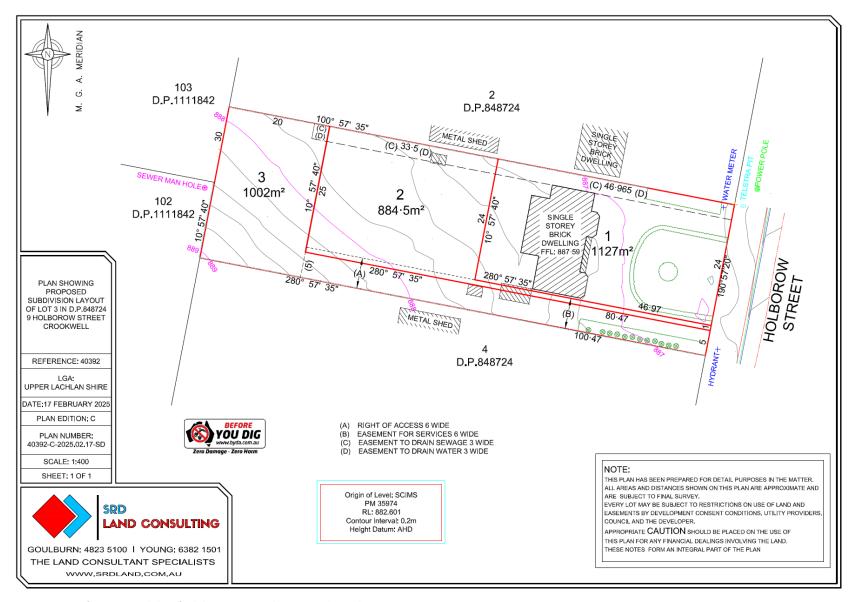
Extract from Proposed Plan of Subdivision, prepared by SRD Land Consulting
